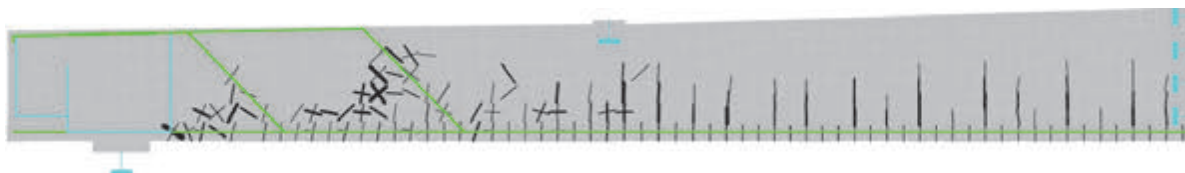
Crack configuration and crack openings of structure B05 at the ultimate load level faces crack patterns at ultimate load, which visualizes cracks at a width of more than 0.1 mm
